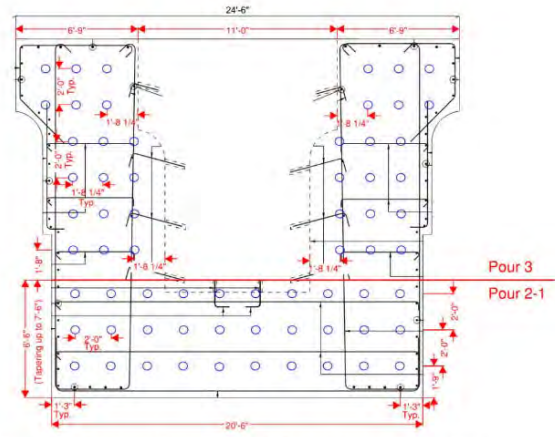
Pier 5 Crossbeam Placements 2-1 and 2-3 Cooling Pipes Layout, Section View
